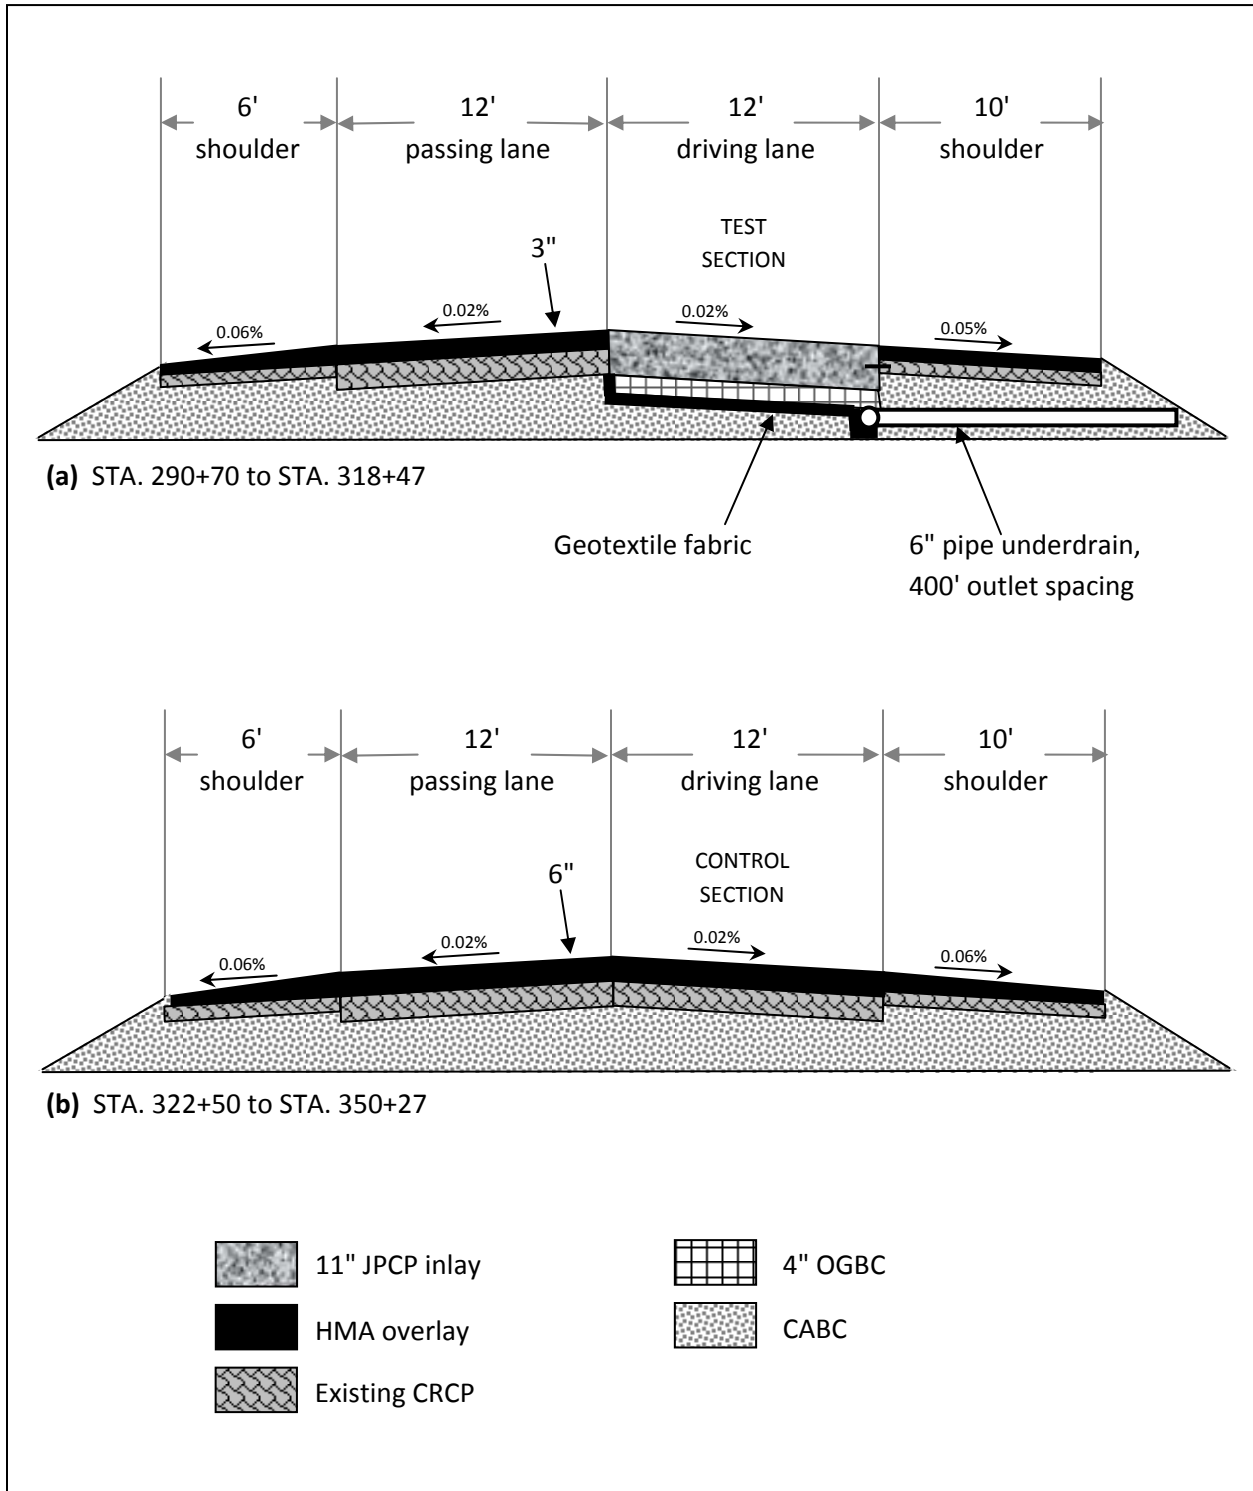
Pavement cross sections: (a) test section; and (b) control section.
